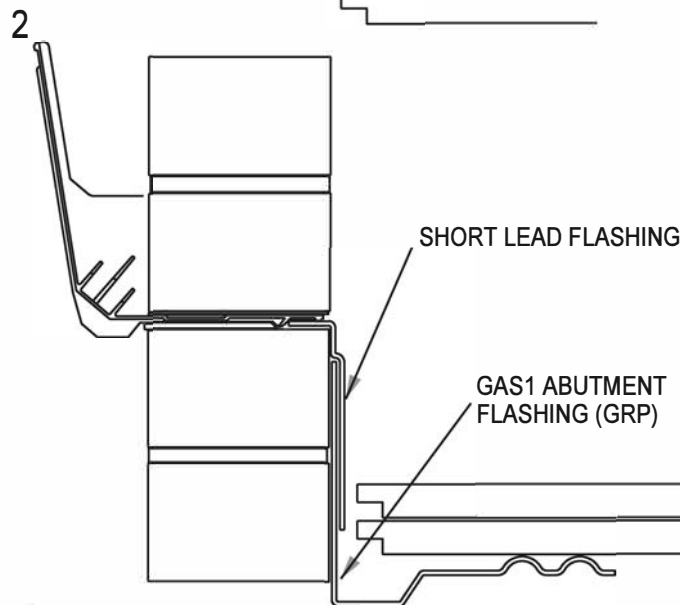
shown an abutment flashing and secret gutter detail. Secret gutters are traditionally made from lead but are now more commonly bought preformed in GRP.
